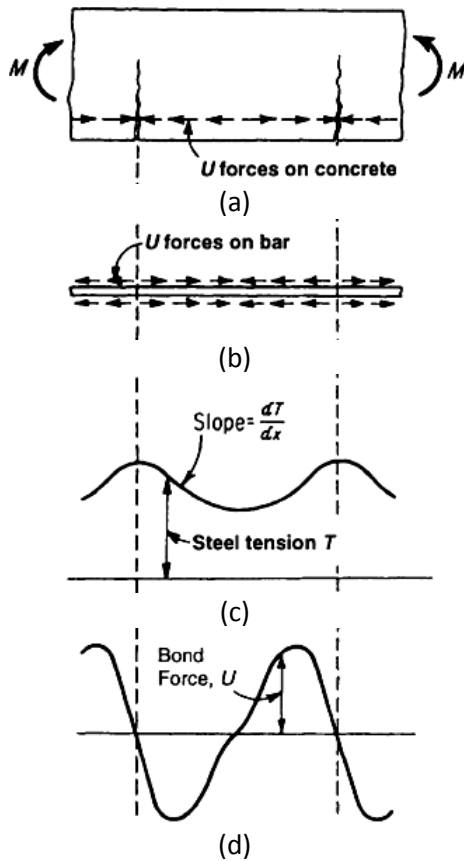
Variation of bond force along length of rebar in reinforced concrete member: (a) cracked concrete member; (b) bond forces on rebar; (c) variation of tensile forces along rebar; (d) variation of bond force acting on reinforcing bar, determined from  $dT/dl$ . (Source: ACI 408R-03)
